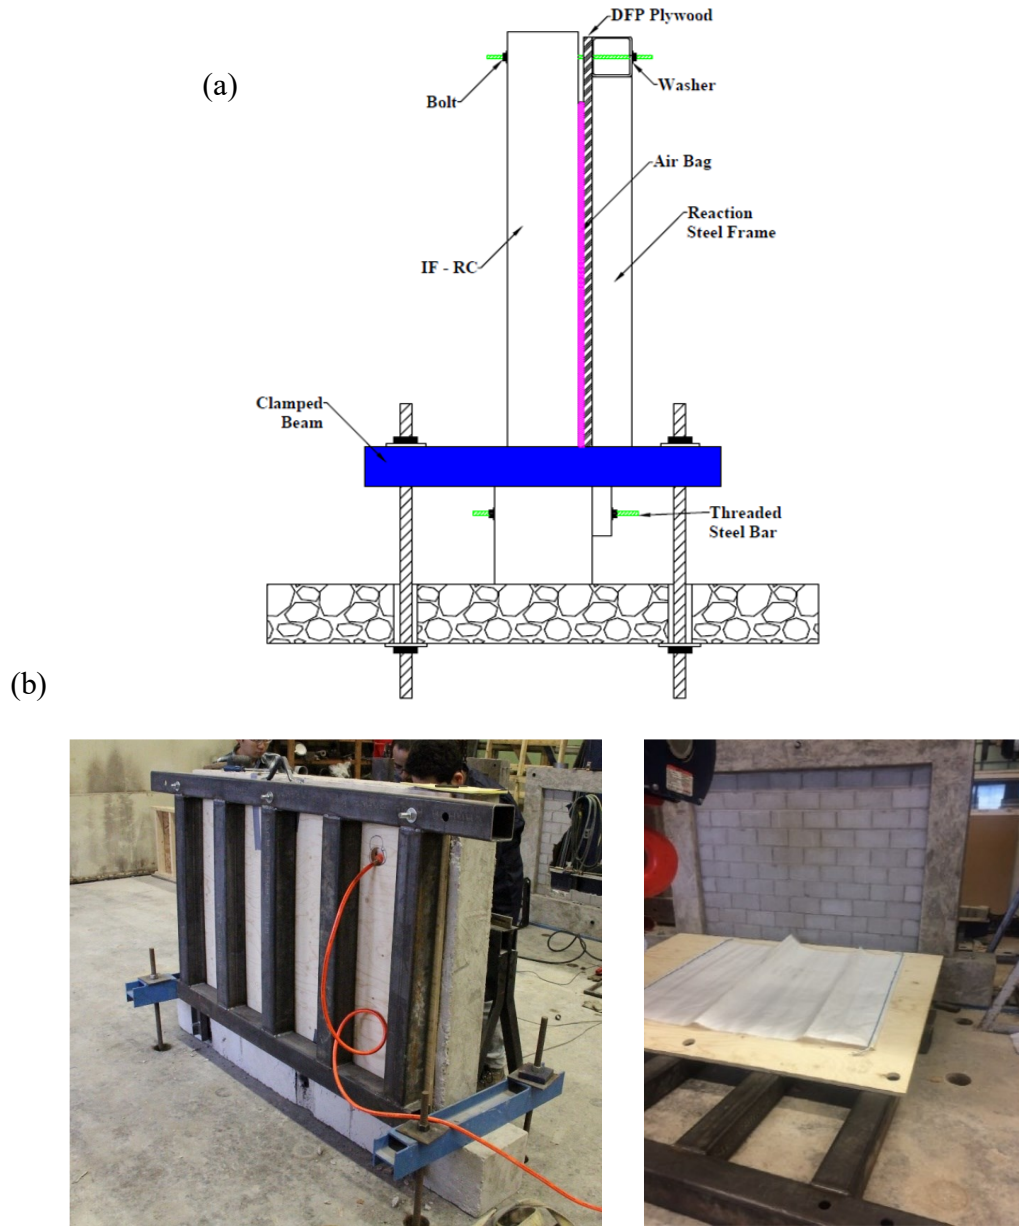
Out-of-plane test setup: (a) Schematic side view; and. (b) setup components
